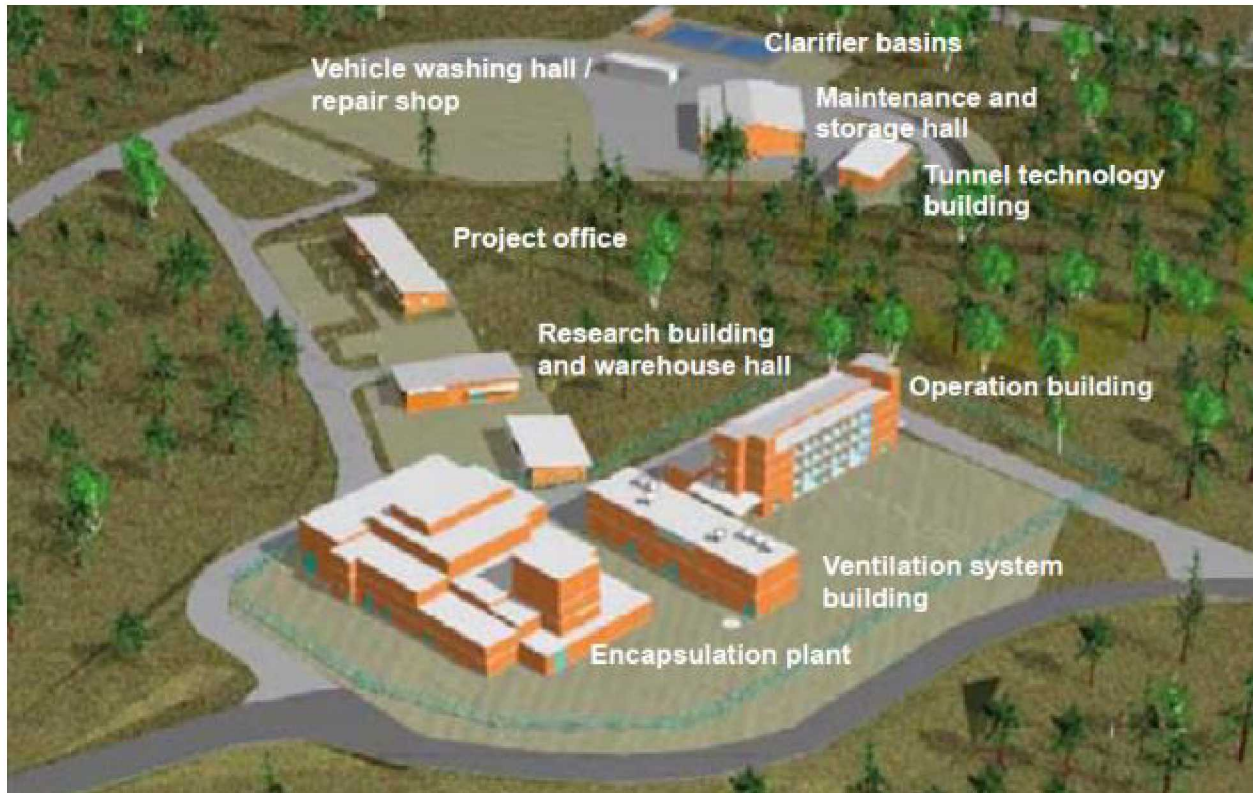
Conceptual layout of planned surface structures at Finland's Olkiluoto GR site.
